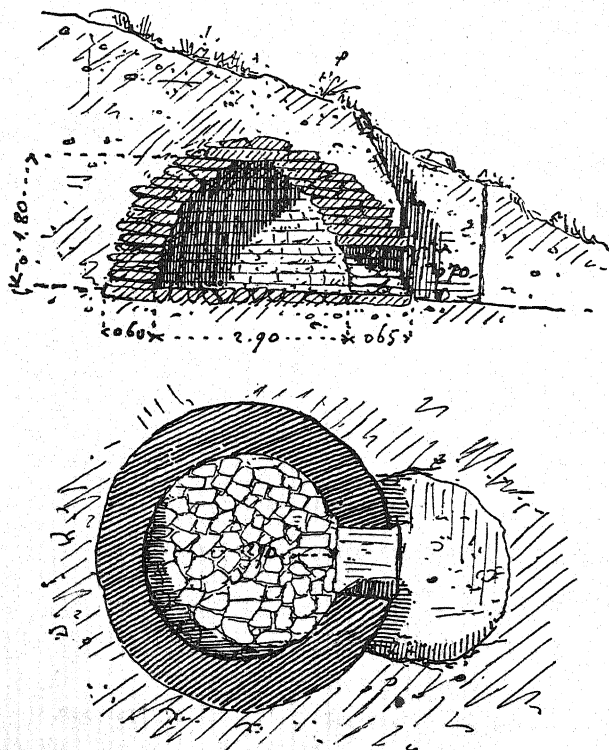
a, b. — THOLOS-TOMB AT COURTES: GROUND PLAN AND ELEVATION, RESTORED.
